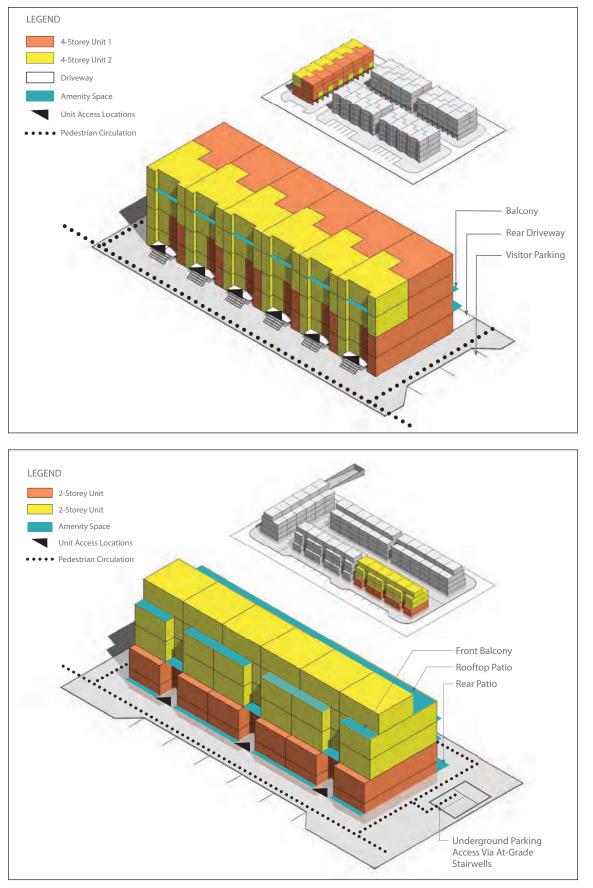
& m – Conceptual massing model of a 2 unit stacked townhouse (top) and a 2 unit urban stacked townhouse. with underground parking (bottom). Options for 3 unit stacked townhouse may be considered.
